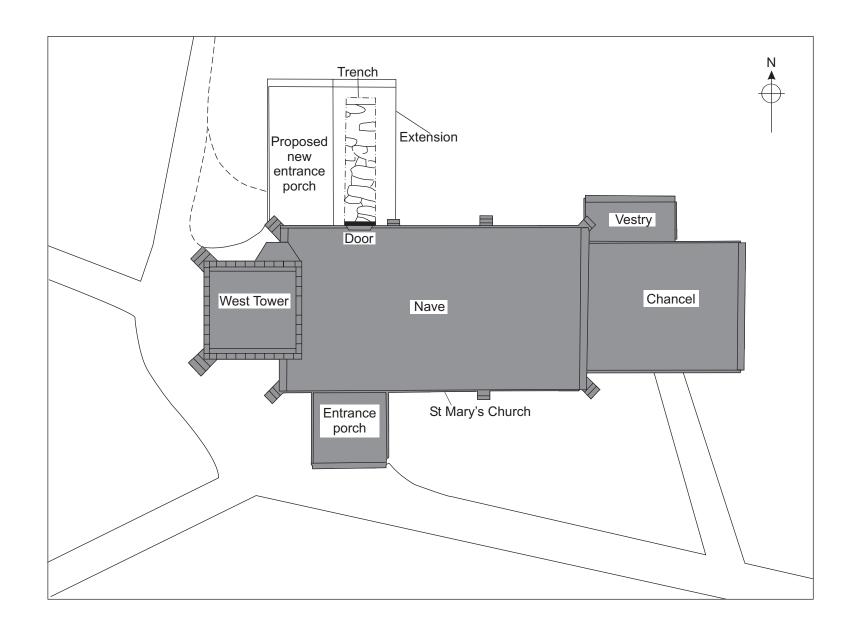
Plan of Church, with trench and main features. Scale 1:200
